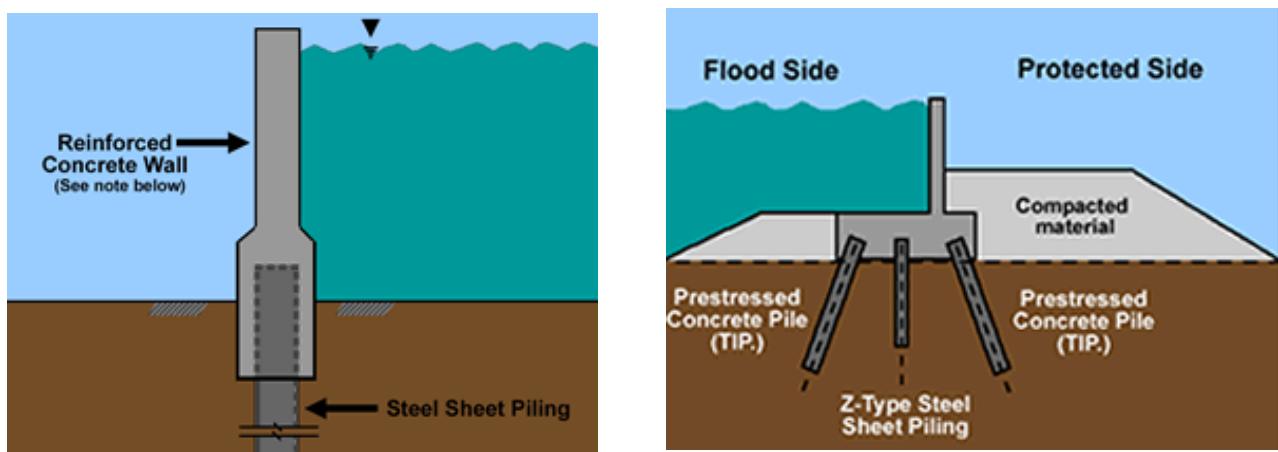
Floodwall Alternative Structure Types (I-walls and T-walls) (ref. USACE)
